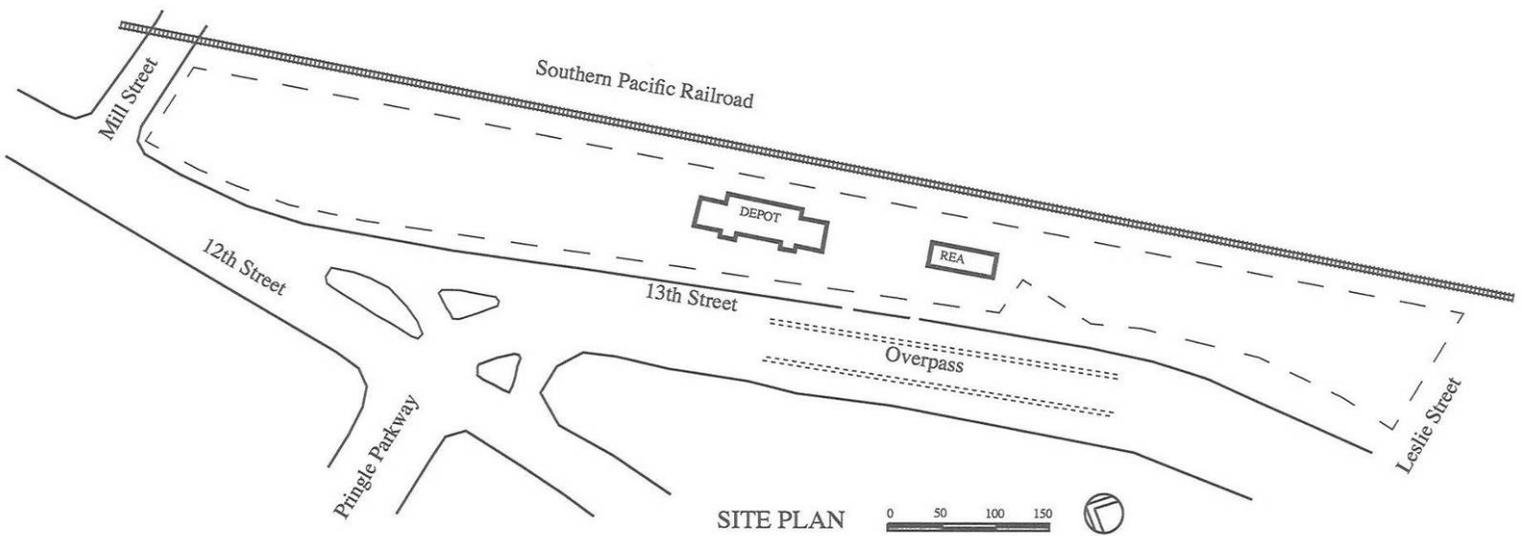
Salem Southern Pacific Railway Station, Site Plan.
